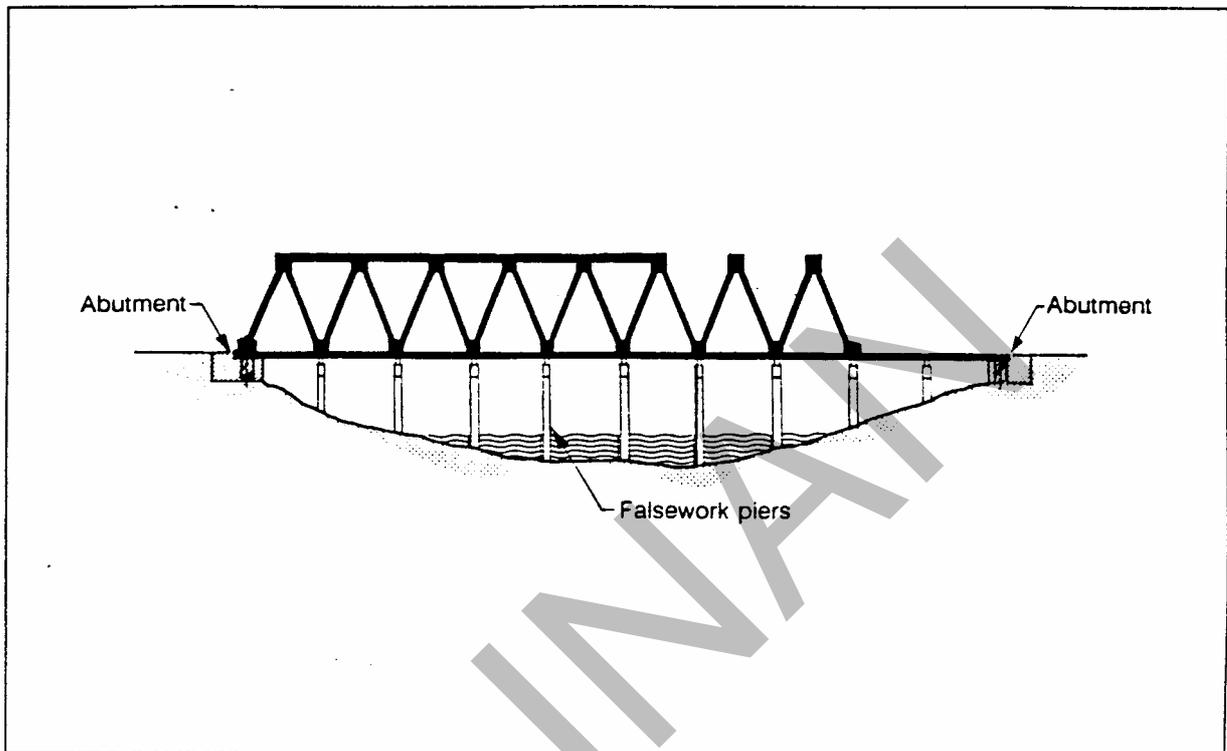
Austrian Permanent Truss - Erection on Falsework
